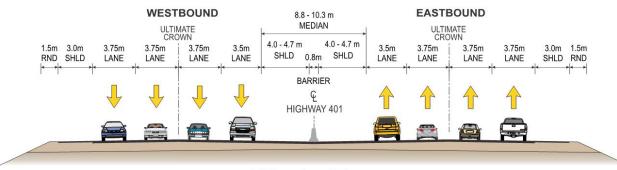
Highway 401 Section 4, Existing and Proposed Cross-Sections
